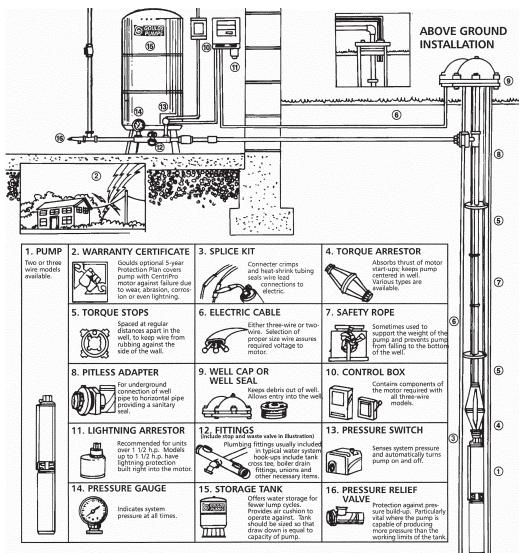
Typical installation for four-inch submersibles. © *ITT Goulds Pumps.
